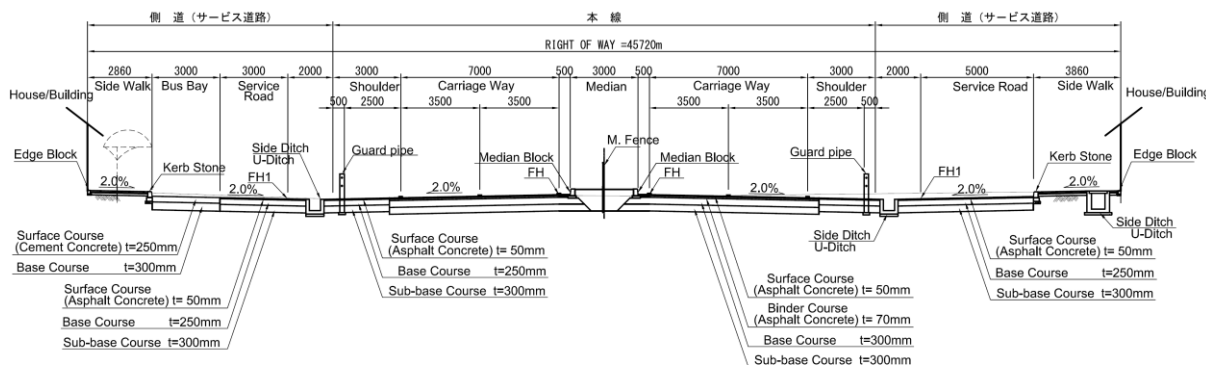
Drainage Facilities Where Service Tracks are Provided
